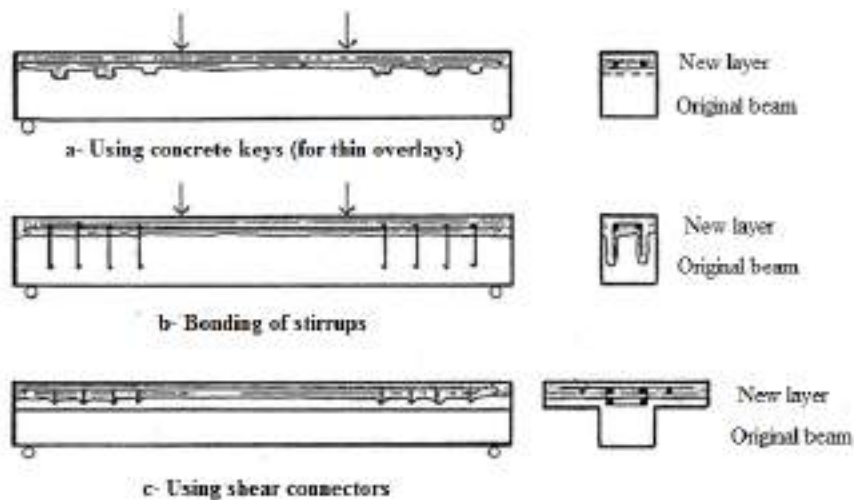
Addition of concrete overlay in compression zone (Source: Abu Almjd, 1988).
